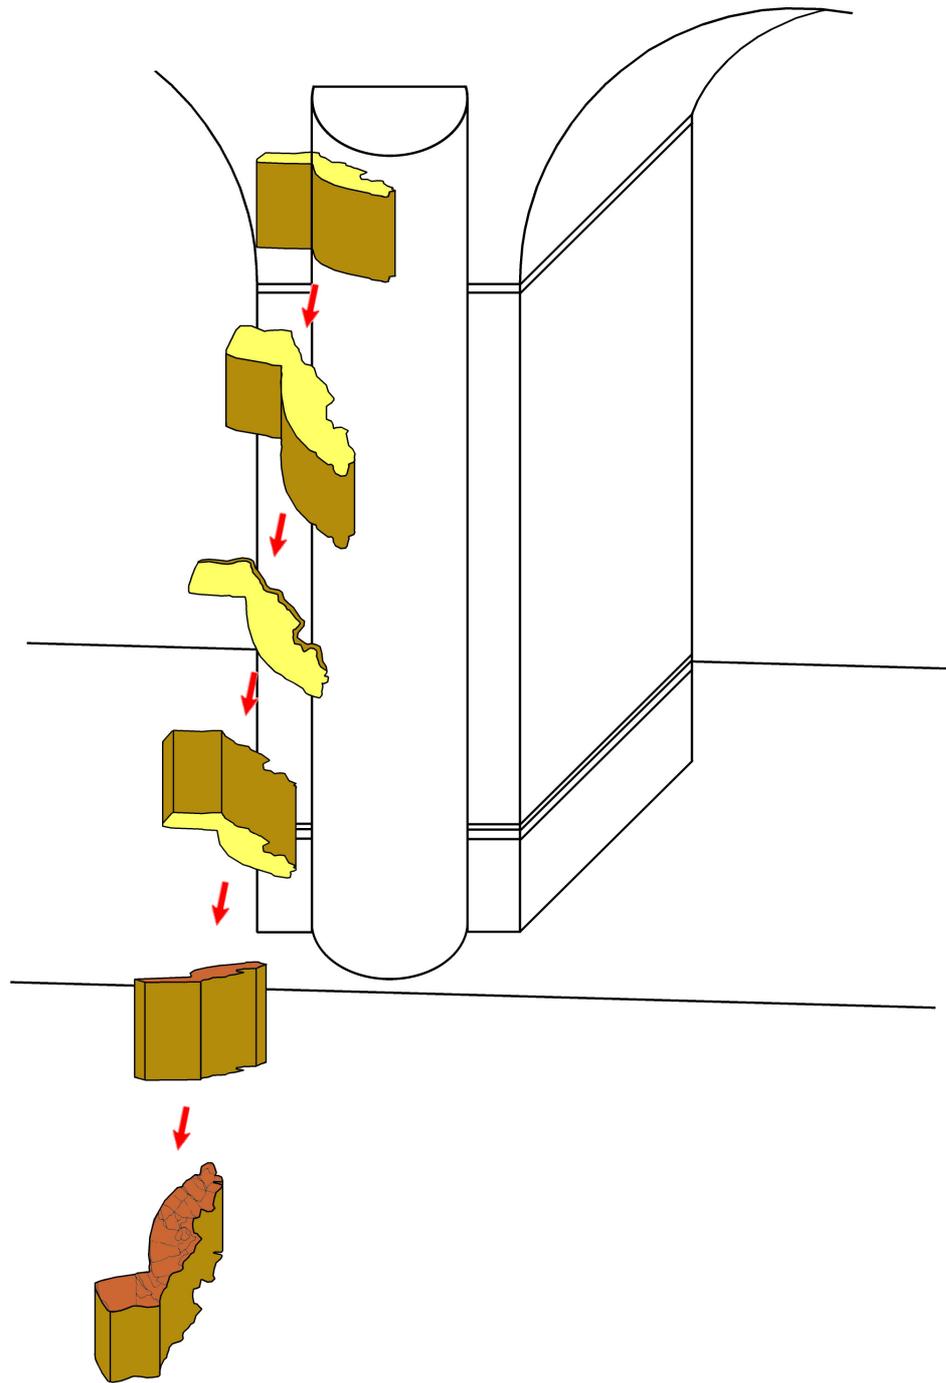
Illustration showing how the column fragment F8 could have tumbled to the ground.
